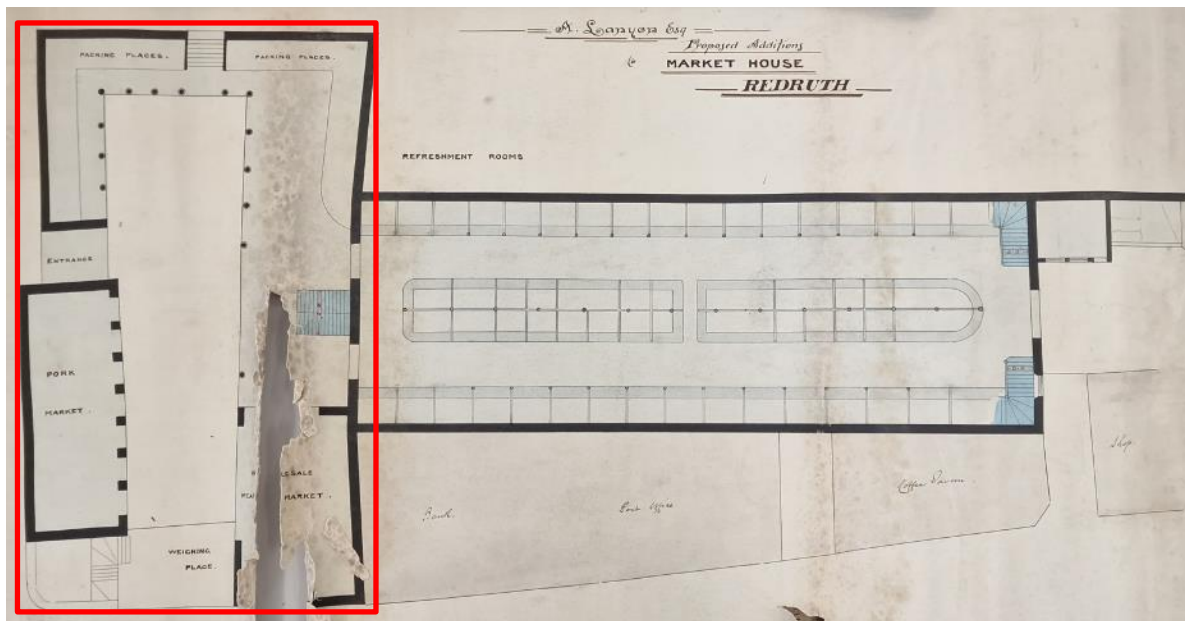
Ground floor plan of proposed but unexecuted additions to the market, November 1892, James Hicks (Kresen Kernow, X44/2). The site of the market courtyard is outlined in red.
